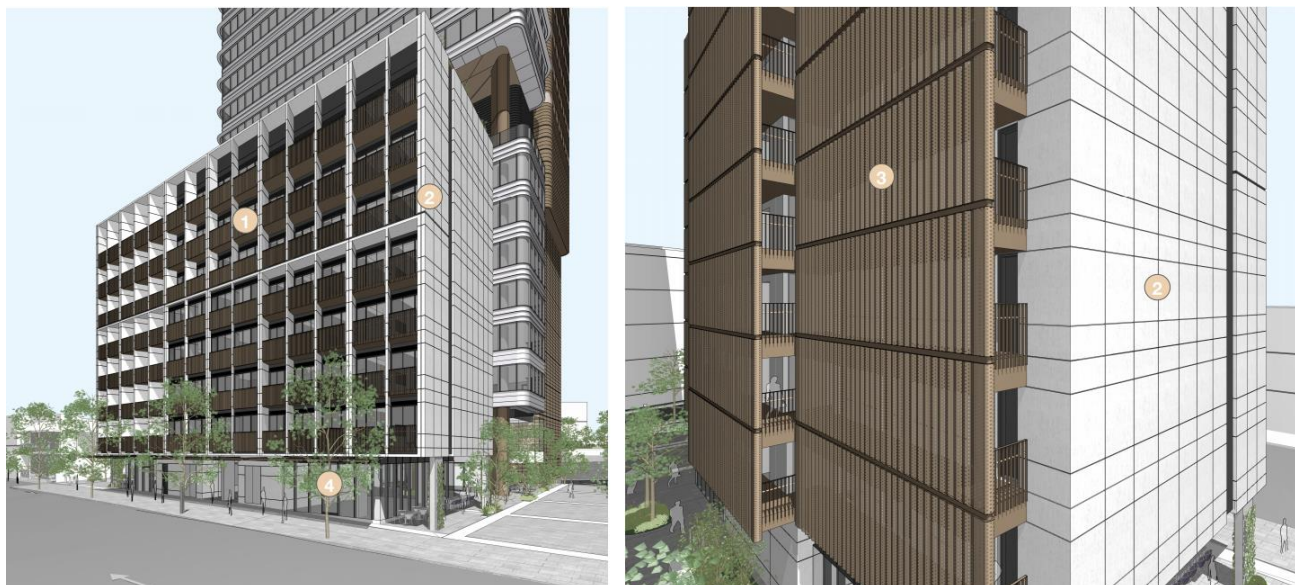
Co-living building materiality as shown at Scott Street Façade (left) and south façade (right)
